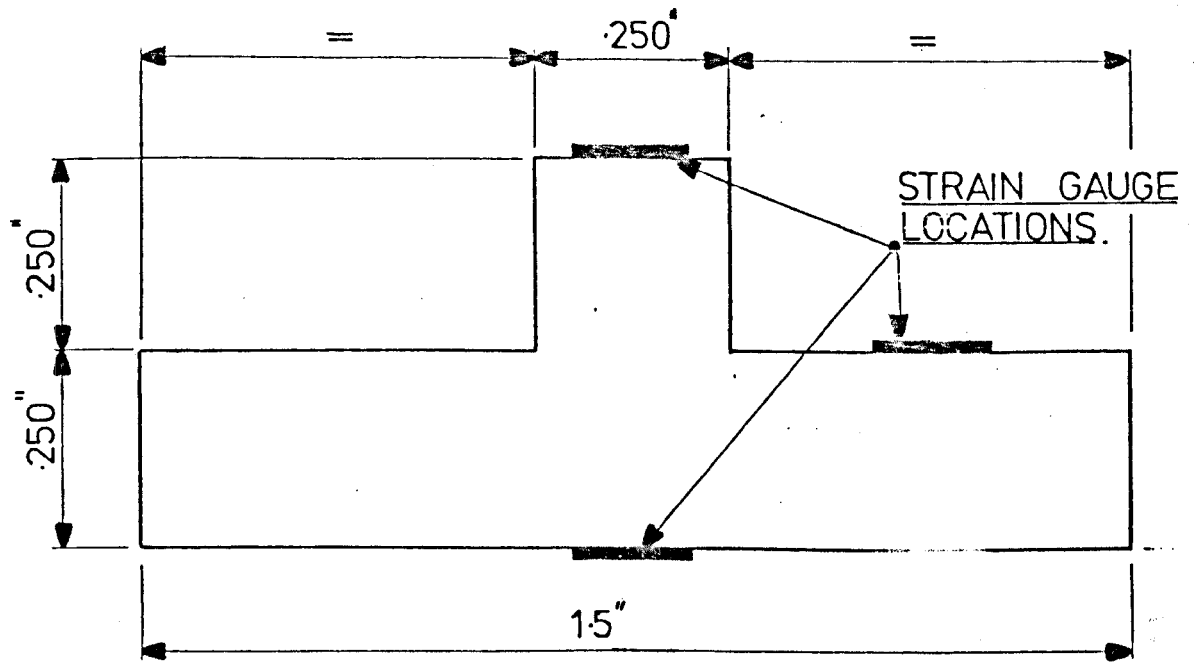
Nominal Cross-Section Dimensions of 'T' Section Beams
